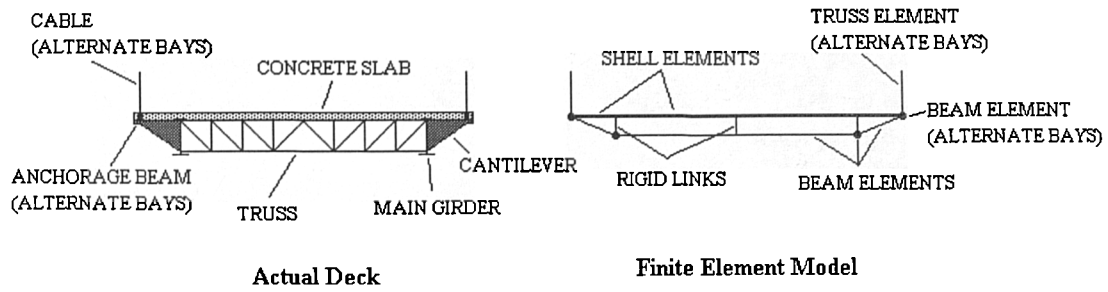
Cross-sections of actual and FE model bridge decks
